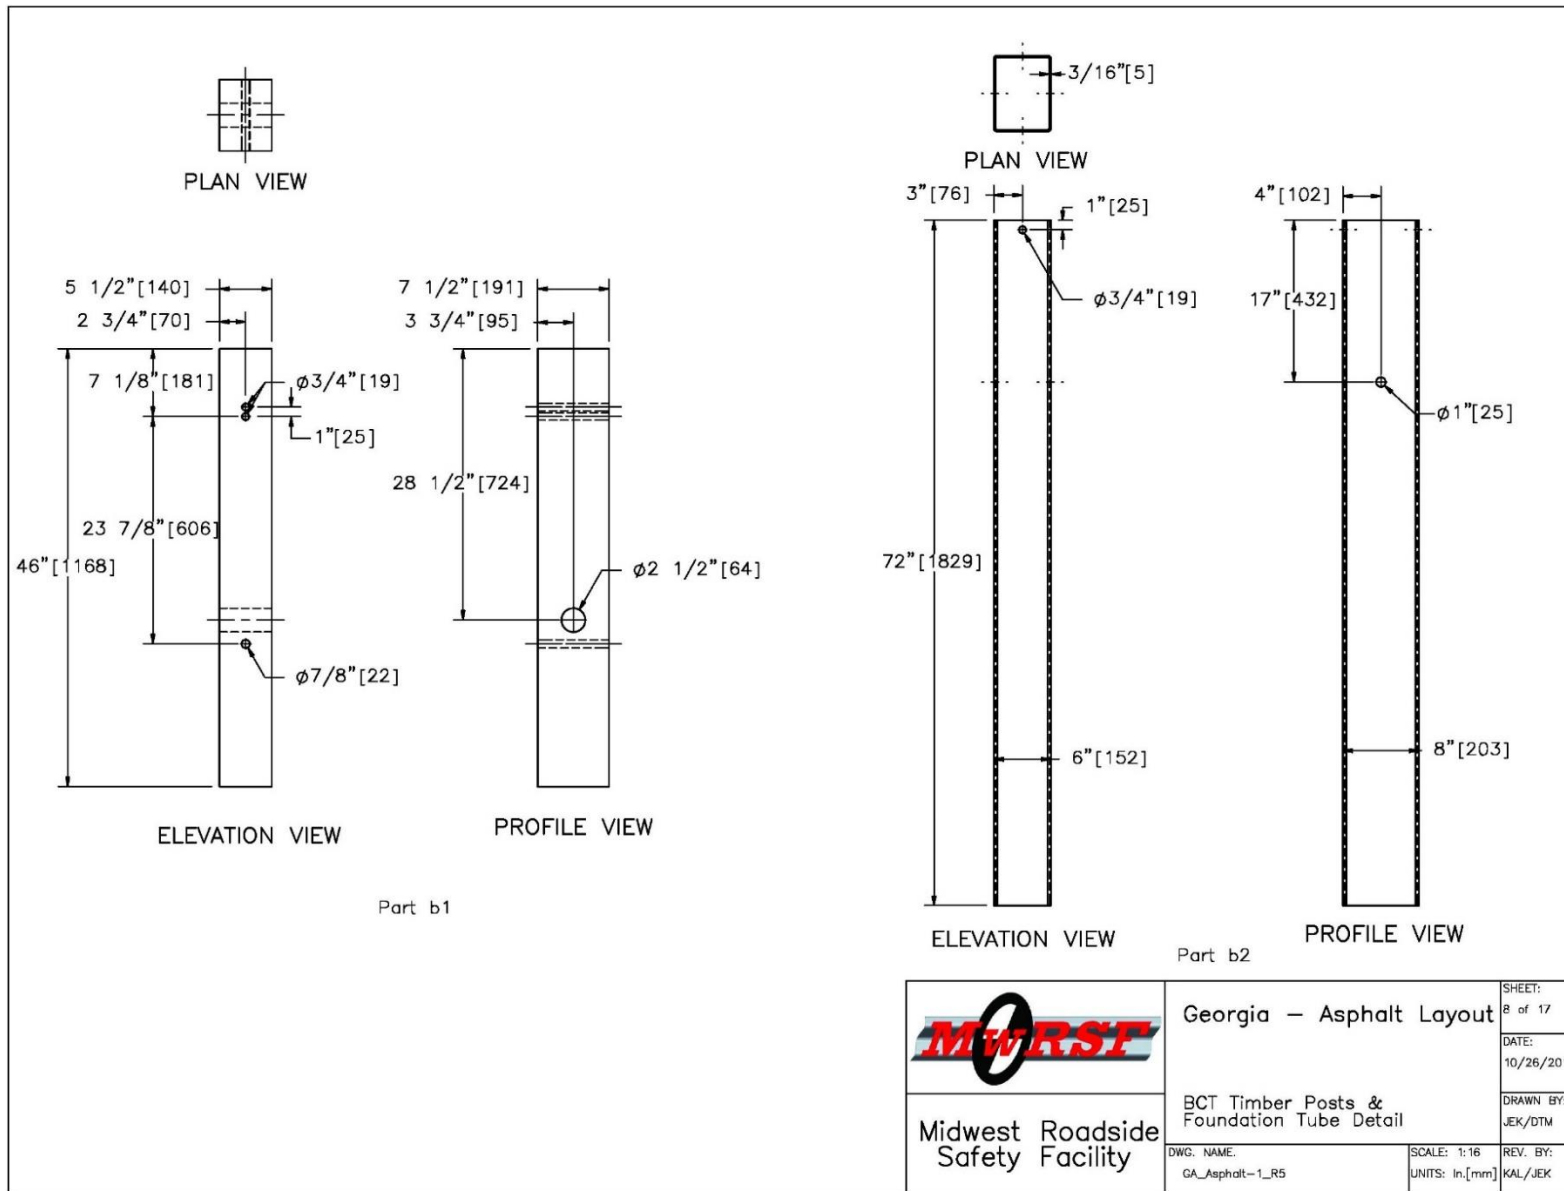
BCT Timber Posts and Foundation Tube Details, Test No. GAA-1
